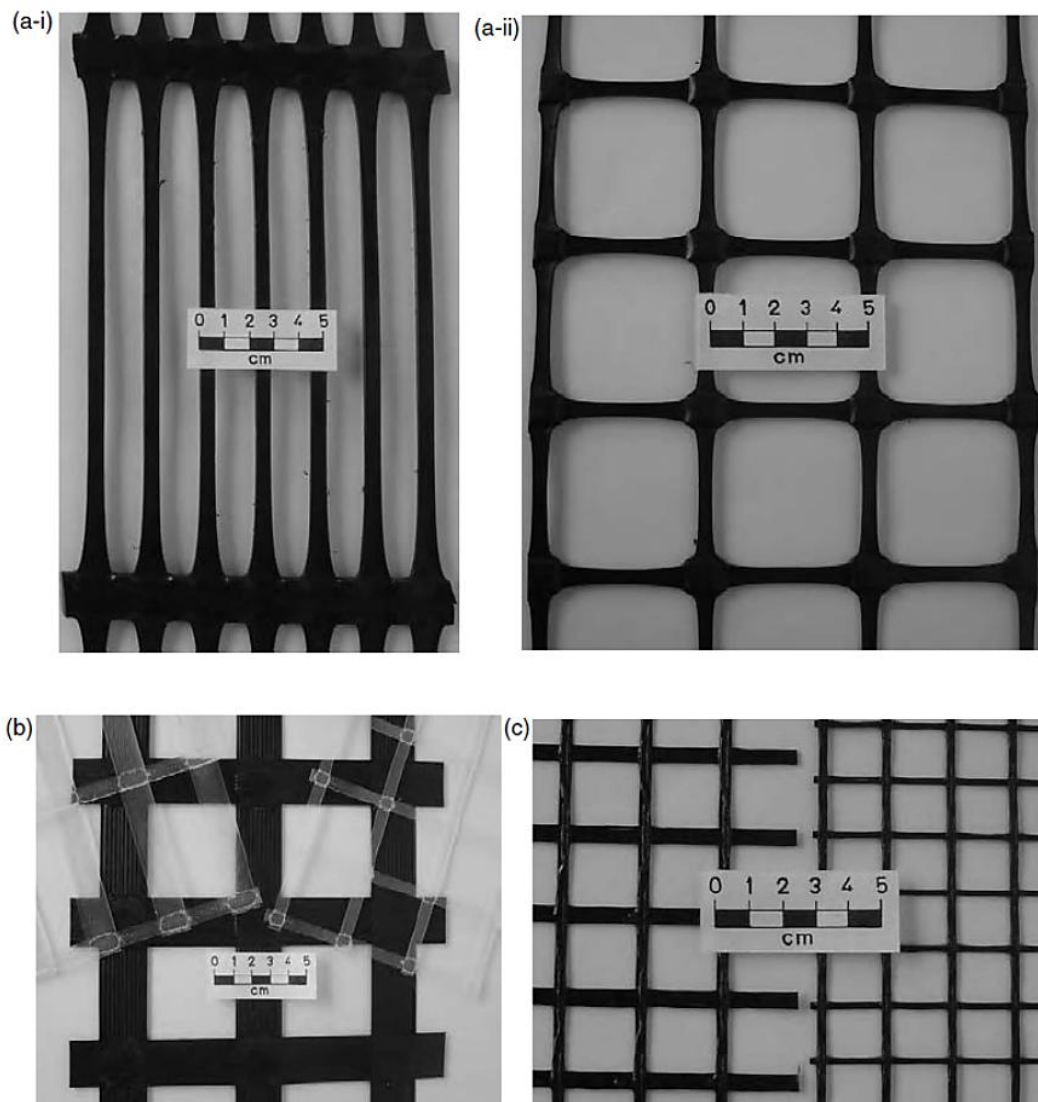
Typical geogrids: (a) extruded – (i) uniaxial; (ii) biaxial; (b) welded; (c) woven.
